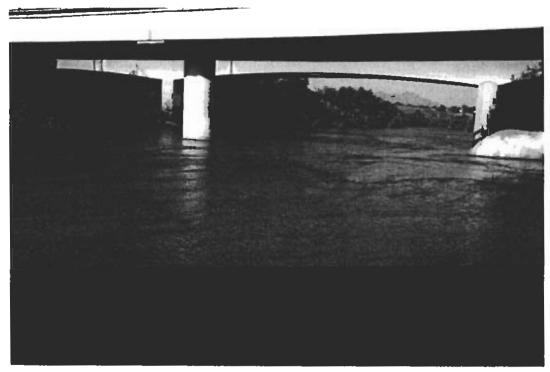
The Santa Ana River at the Van Buren Street bridge.
